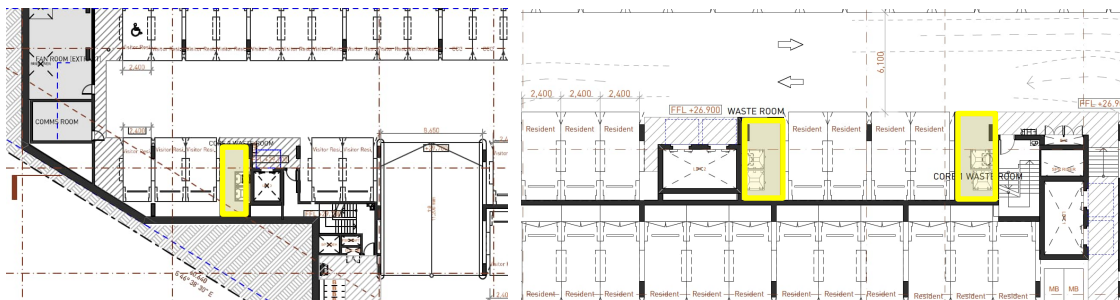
Chute rooms on C1 (left) and C2 (right) in Building C
